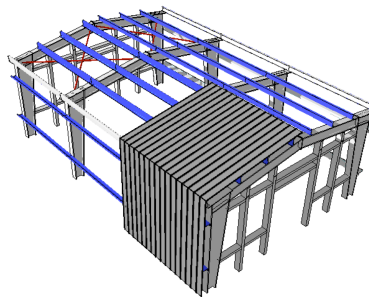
Typical metal building with bare profiled steel panel diaphragms
